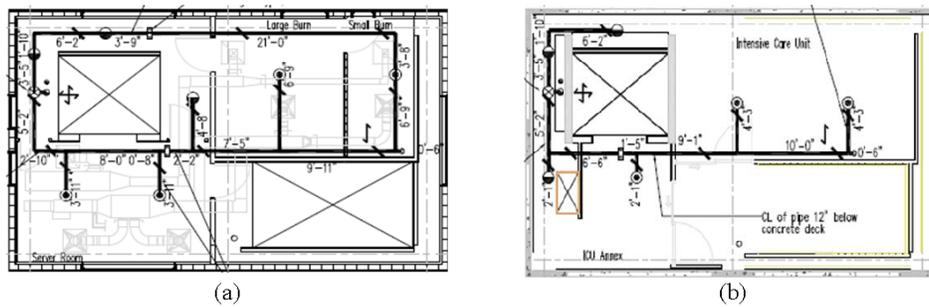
Sprinkler system layout for (a) Floor 3 and (b) Floor 4 [10].
